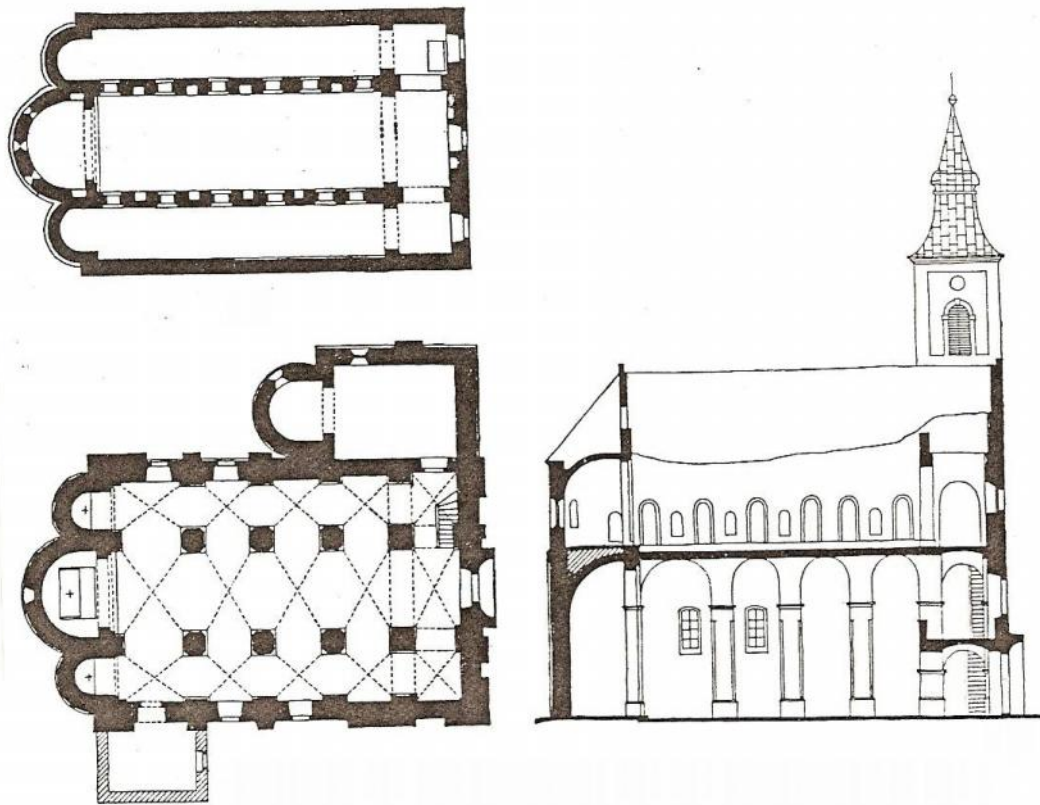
Ground plan and church section of the church of Deáki, after Paradisum Plantavit
